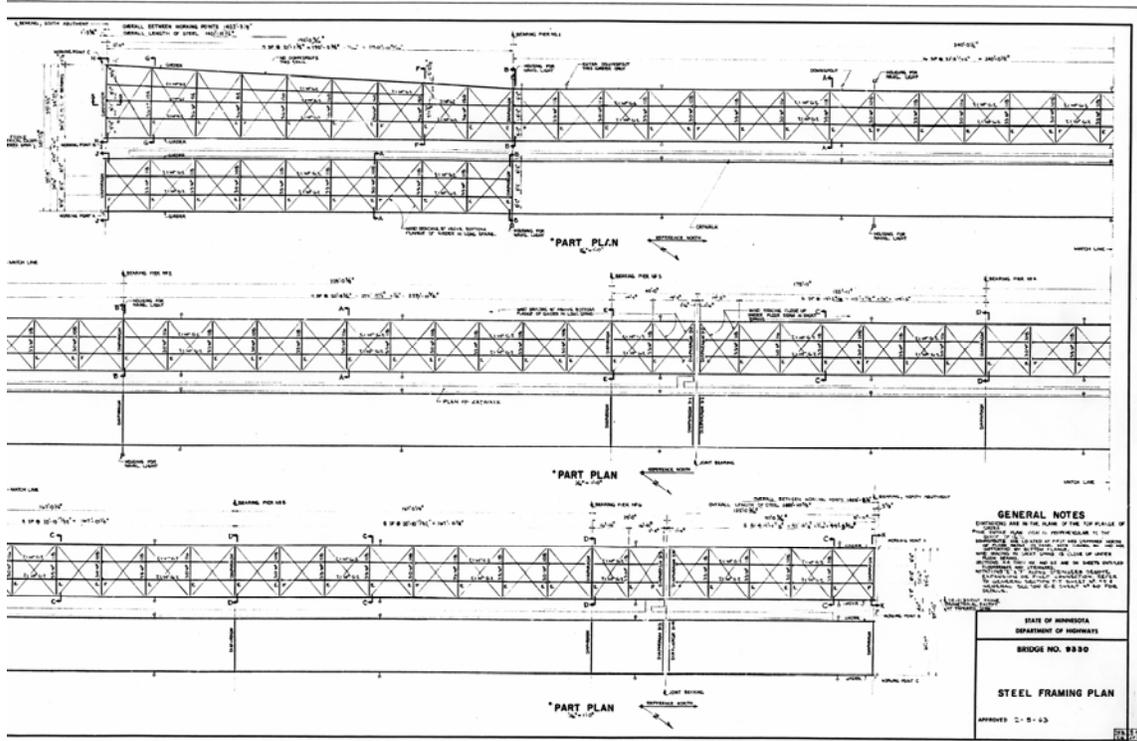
Transverse stiffener web gap – framing plan (Bridge # 9330)
